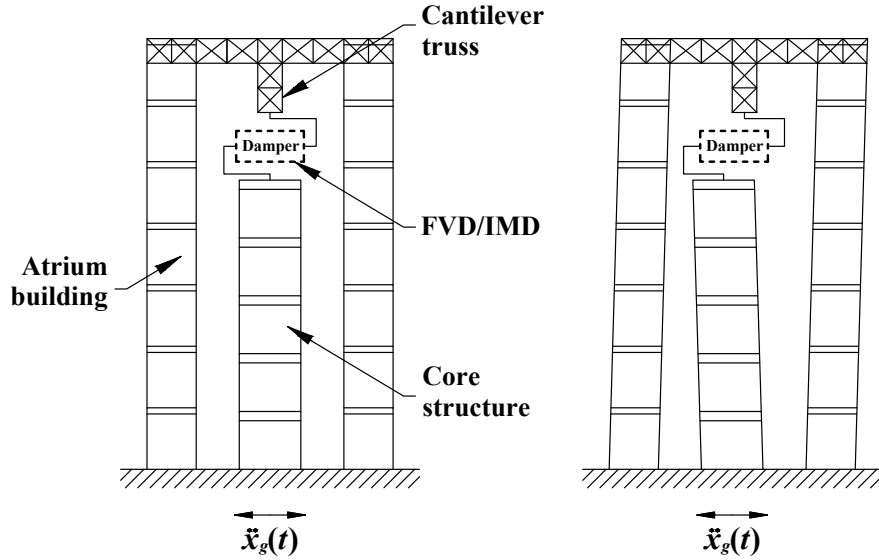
Proposed truss-damper configuration for an atrium building.
